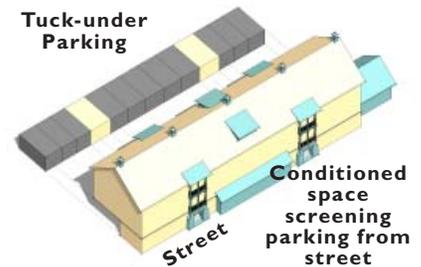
Tuck-under parking is positioned to the rear of buildings, with conditioned space screening the parking from the street onto which the building faces.
